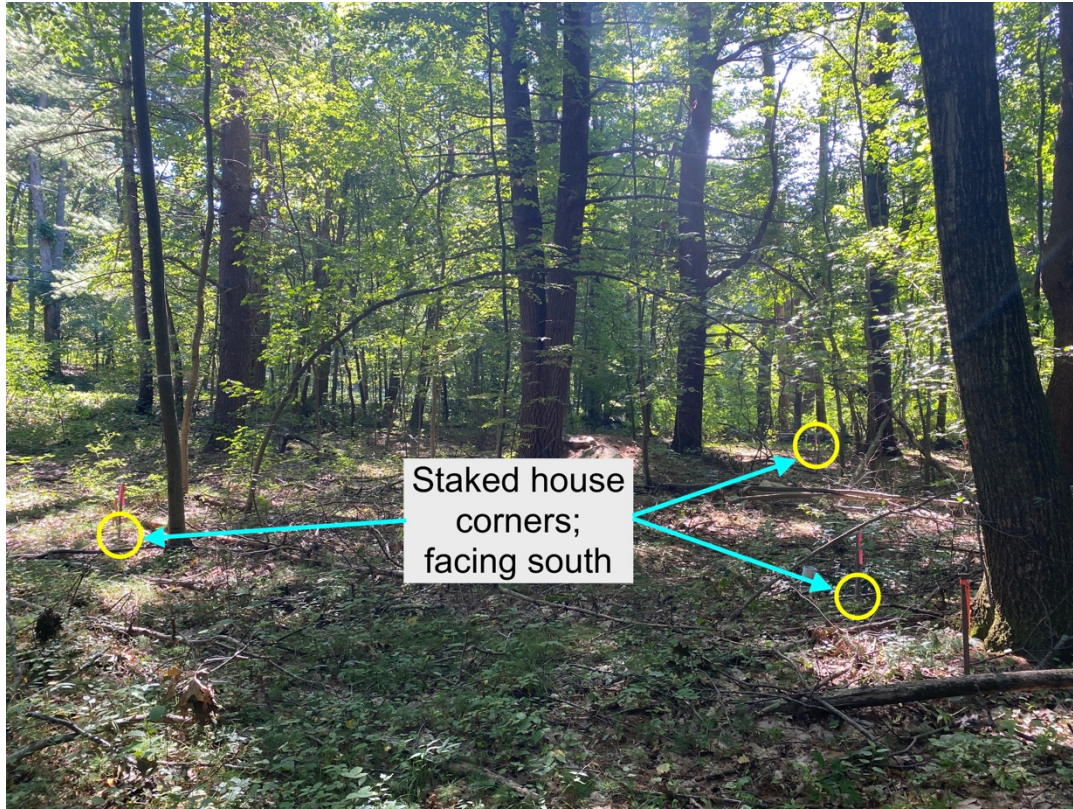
View of staked house corners within AURA Impact Area, facing south.
